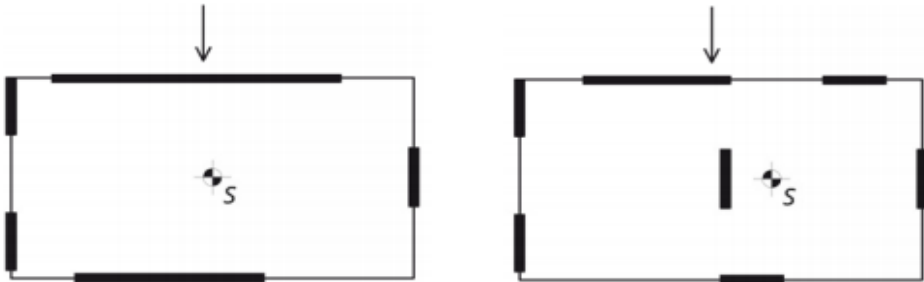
Suitable arrangement of shear wall (Wallner-Novak, Koppelhuber, & Pock, 2014)
